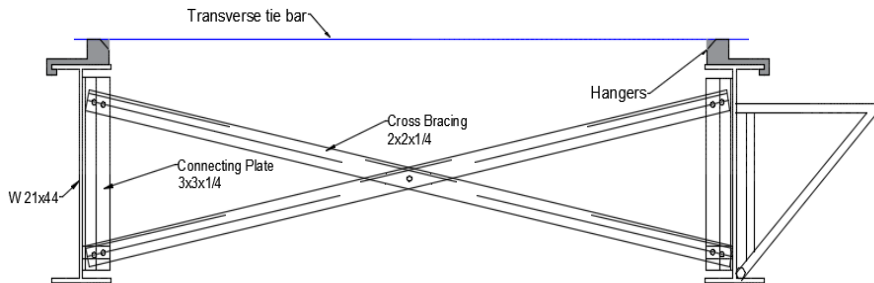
Cross section with adjusted diagonal tie + horizontal pipe (ADT + DP).
